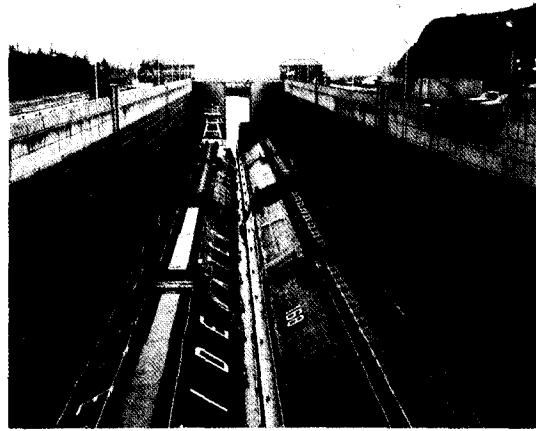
Bonneville Lock, Tow in Lock chamber looking downstream.
